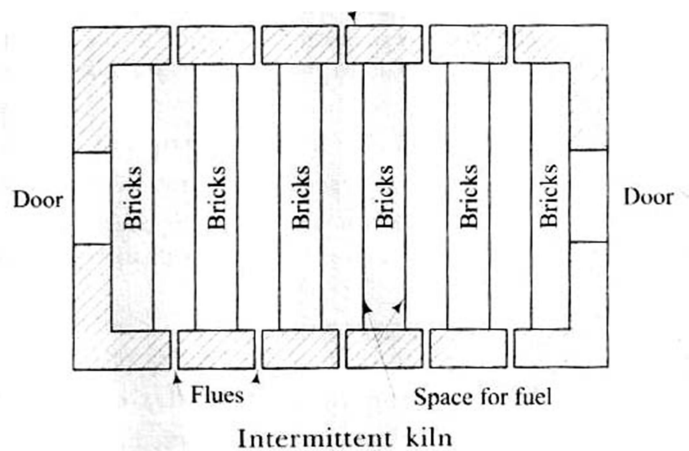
shows the plan of a typical intermittent up-draught kiln. The working of the kiln is as follows:
